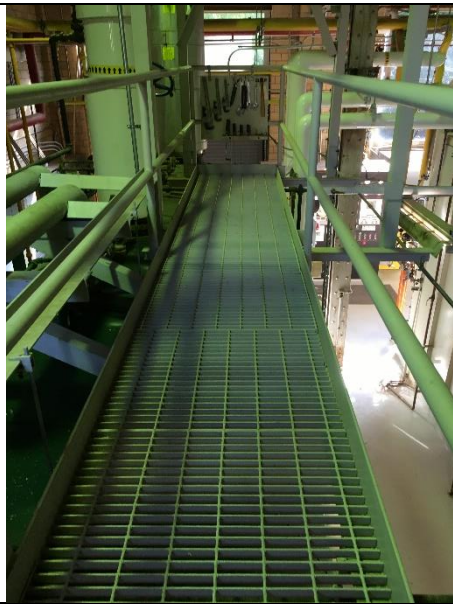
Building 2 Boiler Room-Handrail above Boiler 3
